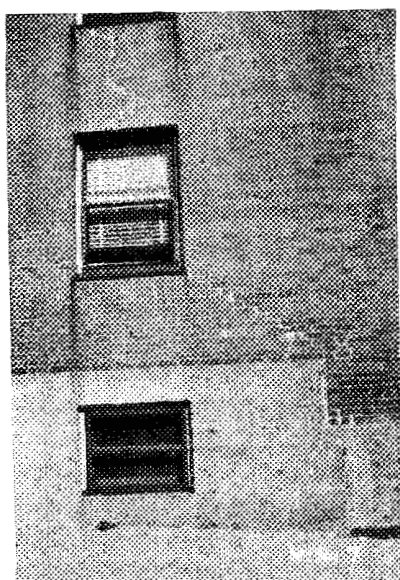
Foundation and brickwork cracks at point where elevations of adjoining foundations are at different levels.
